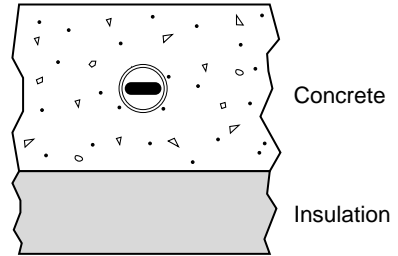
Heating cable inside electrical conduit embedded in the floor.
